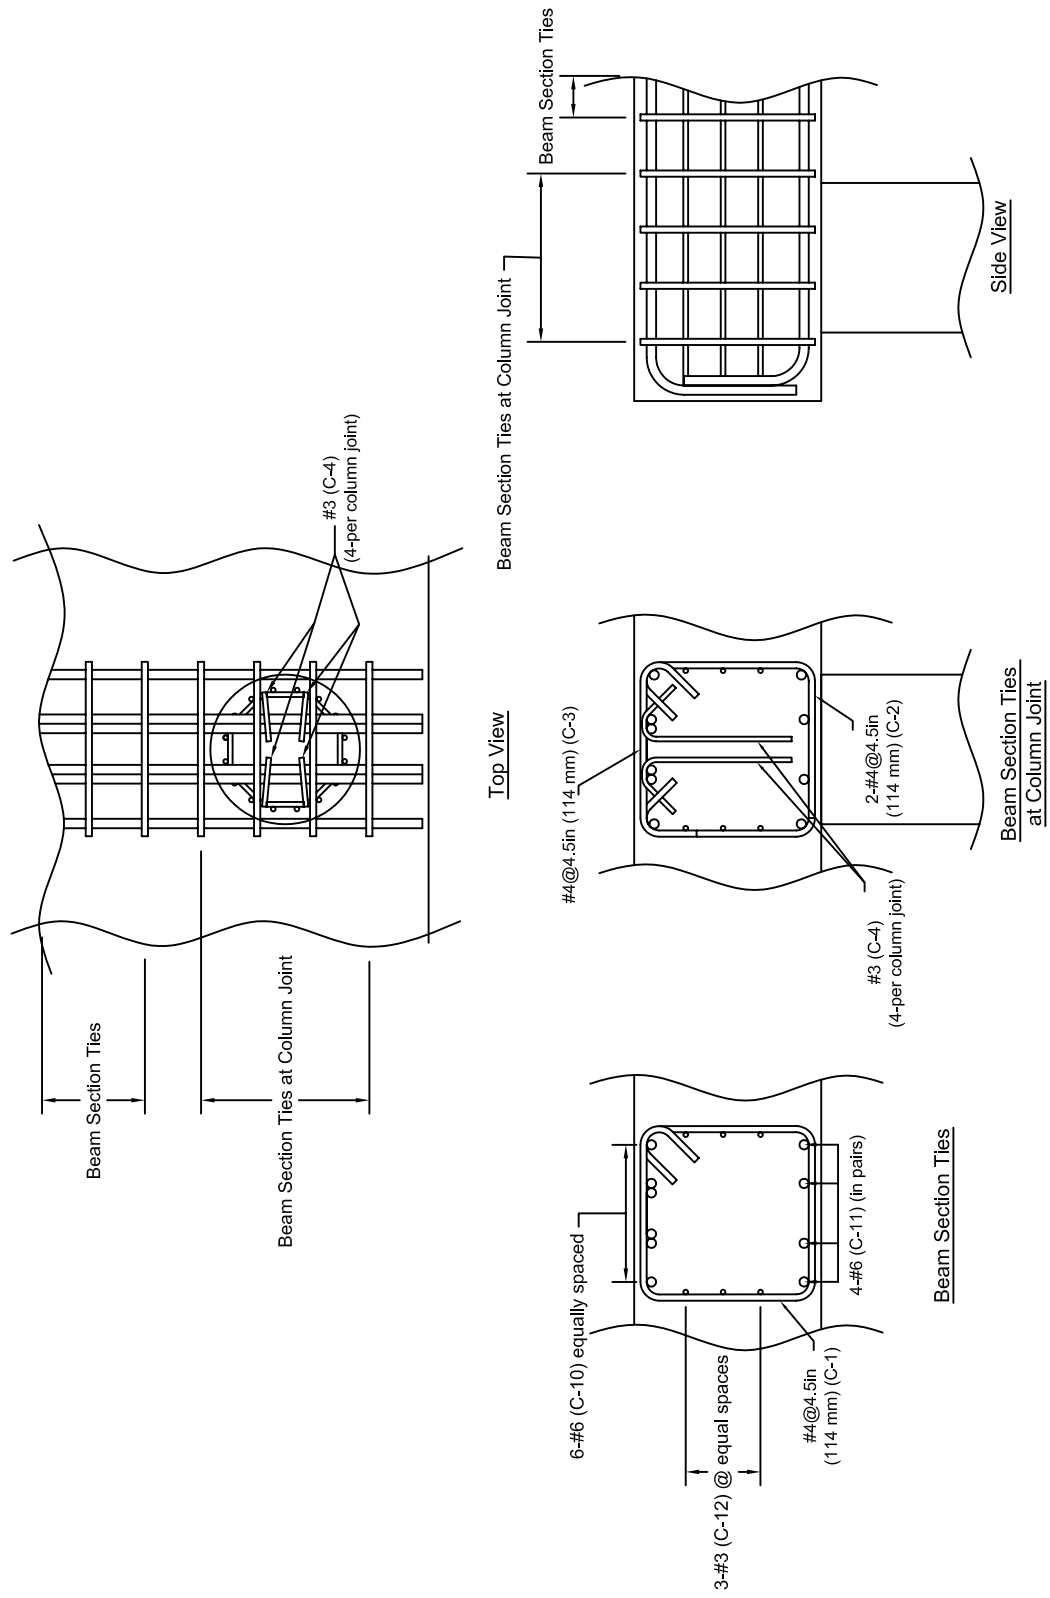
Bridge Plans Sheet 5; Bent 1&3 Joint Reinforcement.
